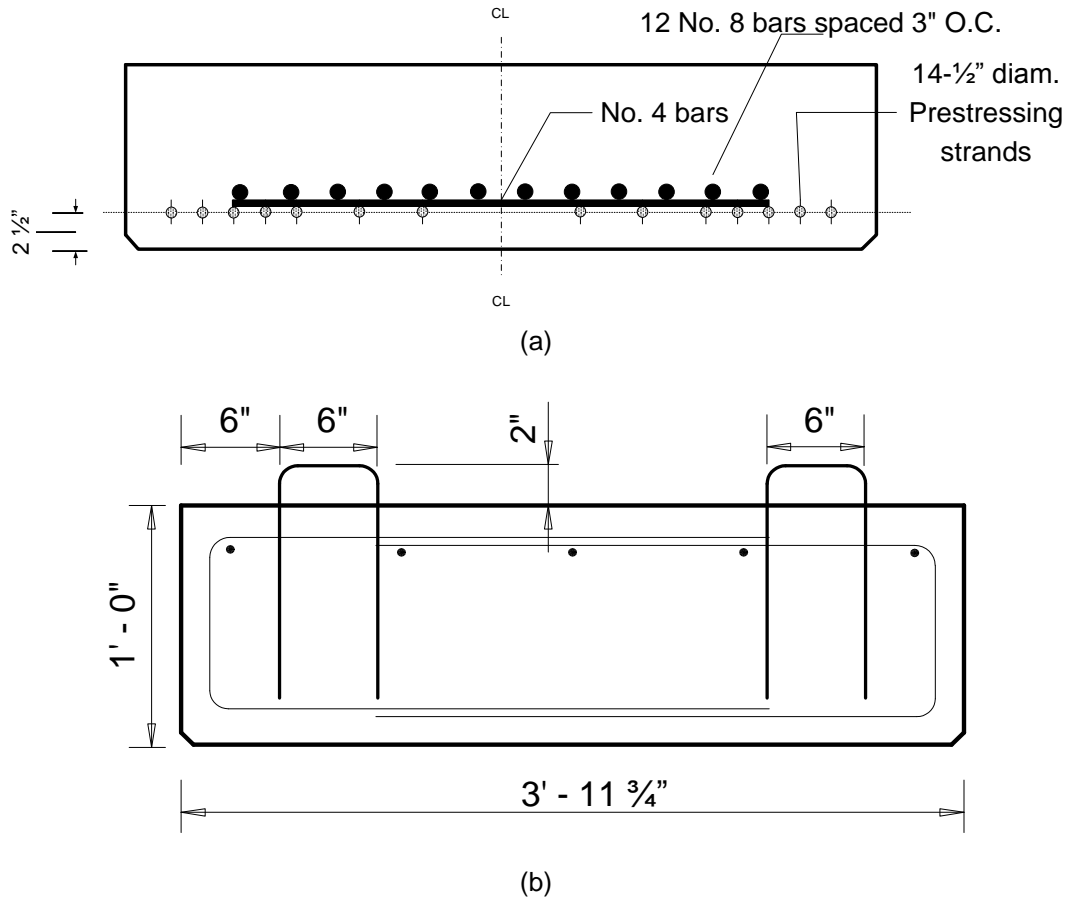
4SB12 section with (a) tension reinforcements and (b) horizontal shear reinforcements
